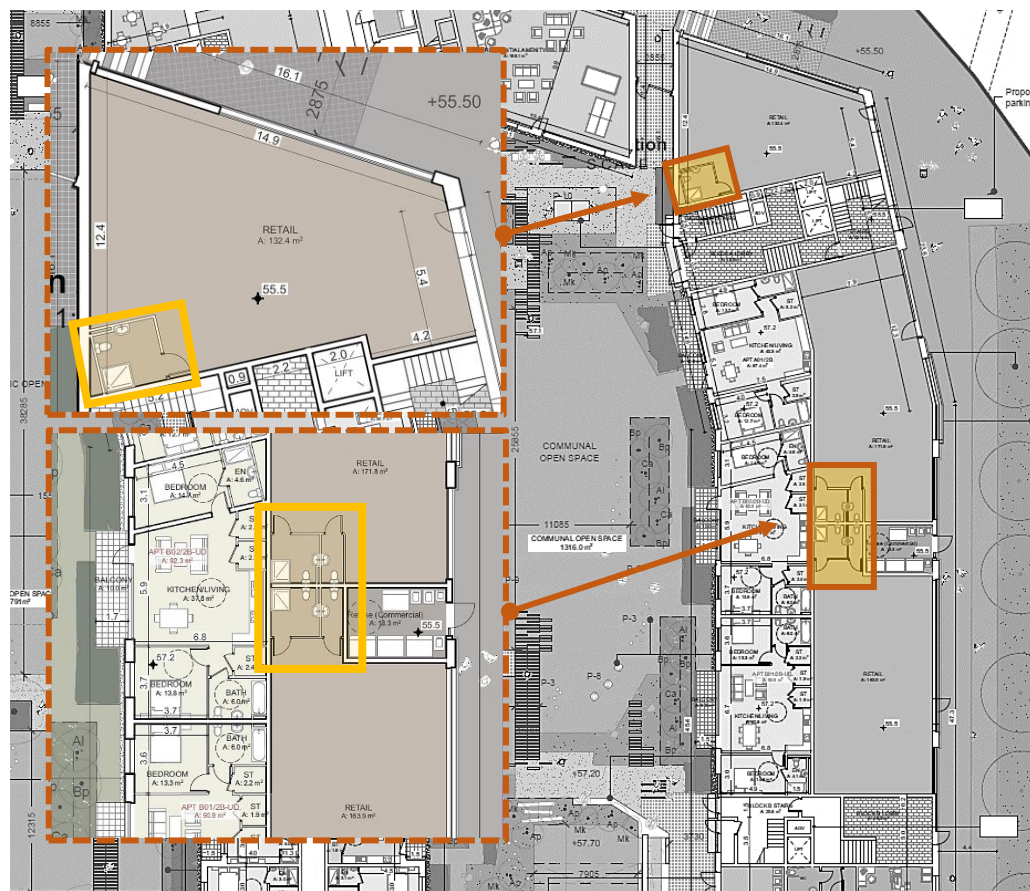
Proposed Shower/Changing Rooms at Retail Units at Blocks A and B
